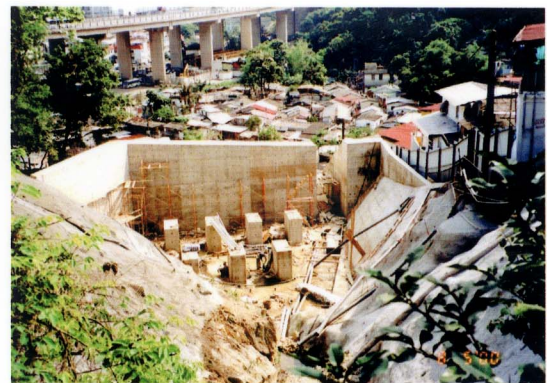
6-m High Check Dam under Construction in Sham Tseng
